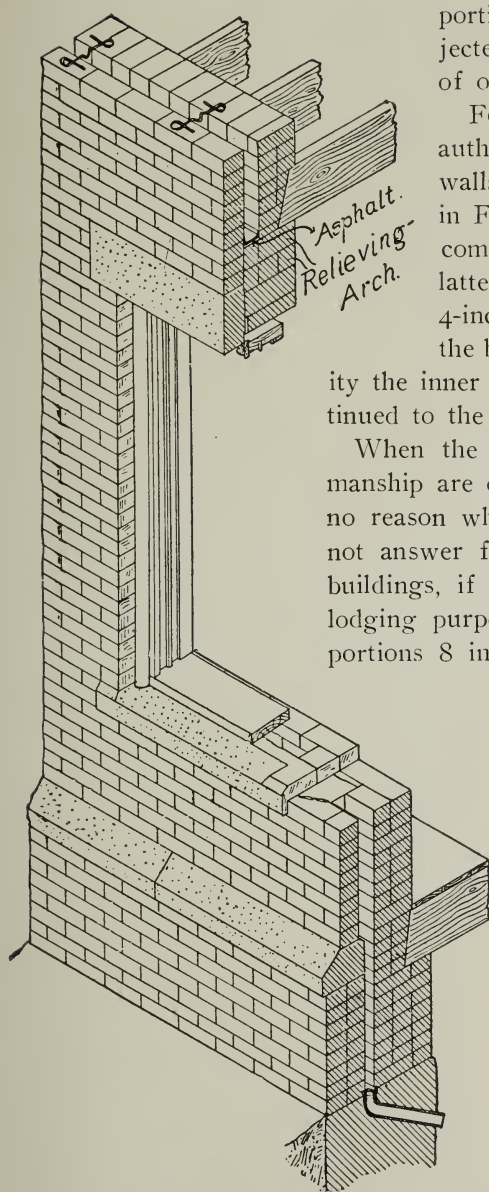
Brick Hollow-wall Construction for Two-story Buildings.
